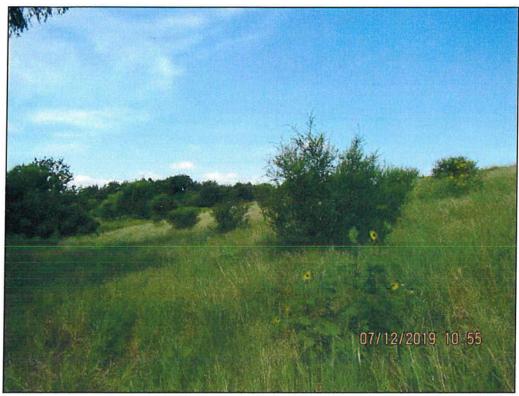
Downstream slope. Mid embankment. Looking right. Note trees and brush.
